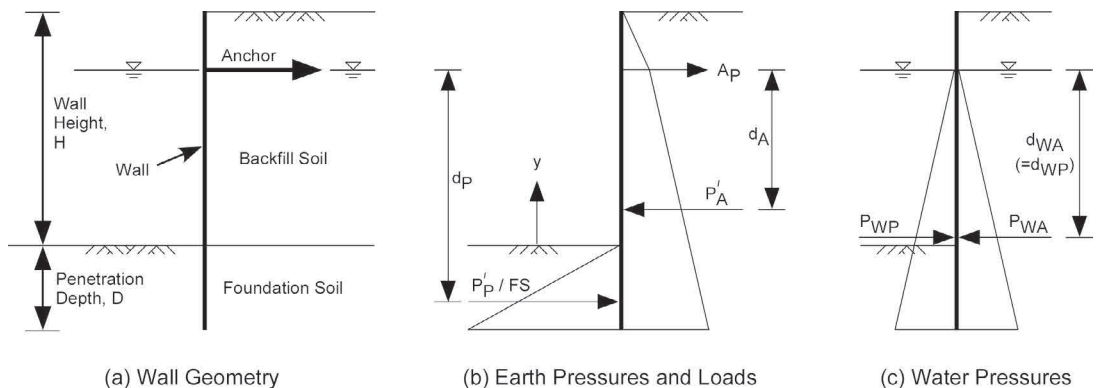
Typical sheet pile wall section and forces acting on the wall used in free earth method
